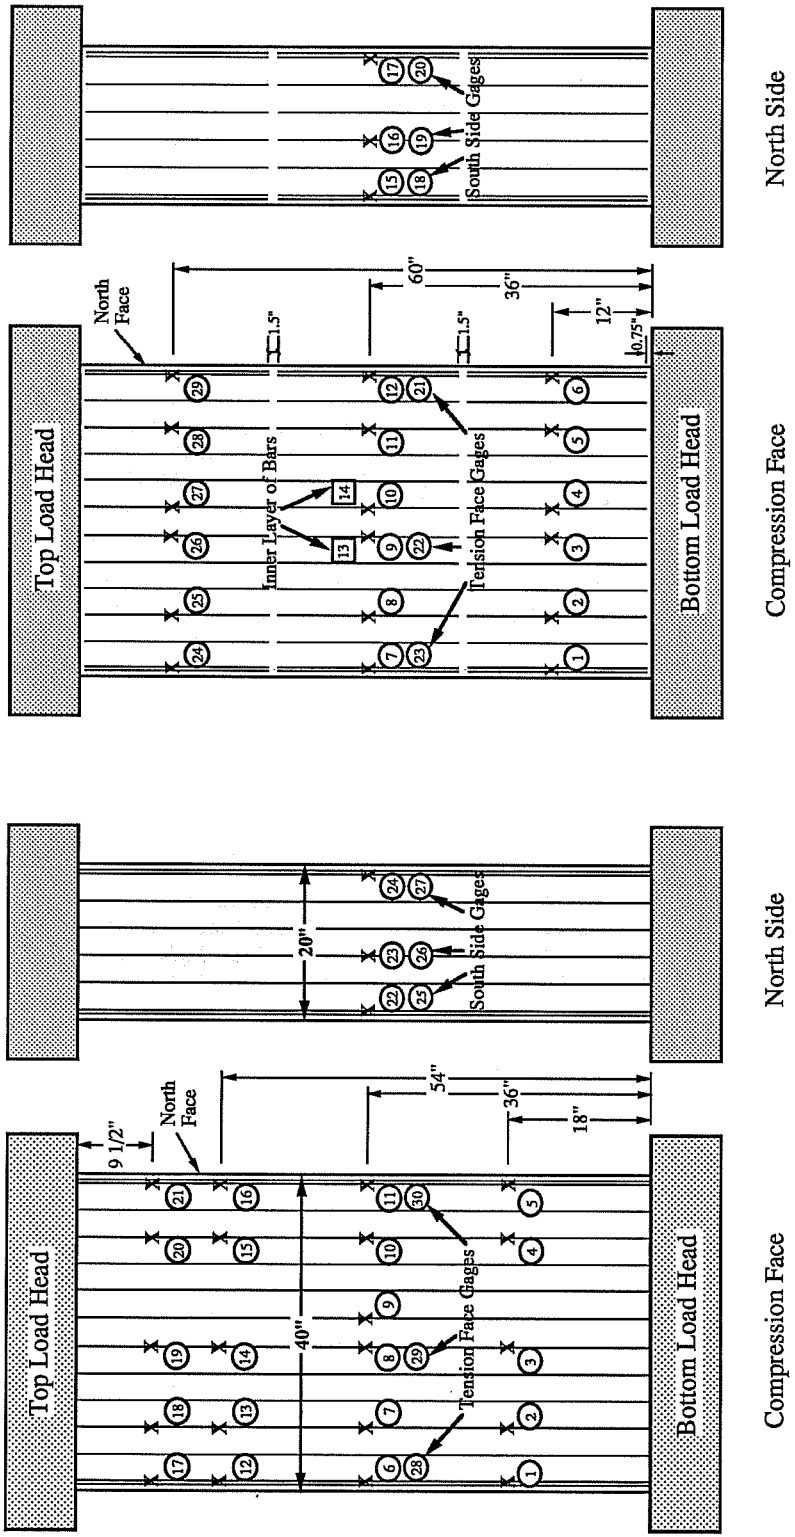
Specimens 1M and 1S Strain Gage Layout
